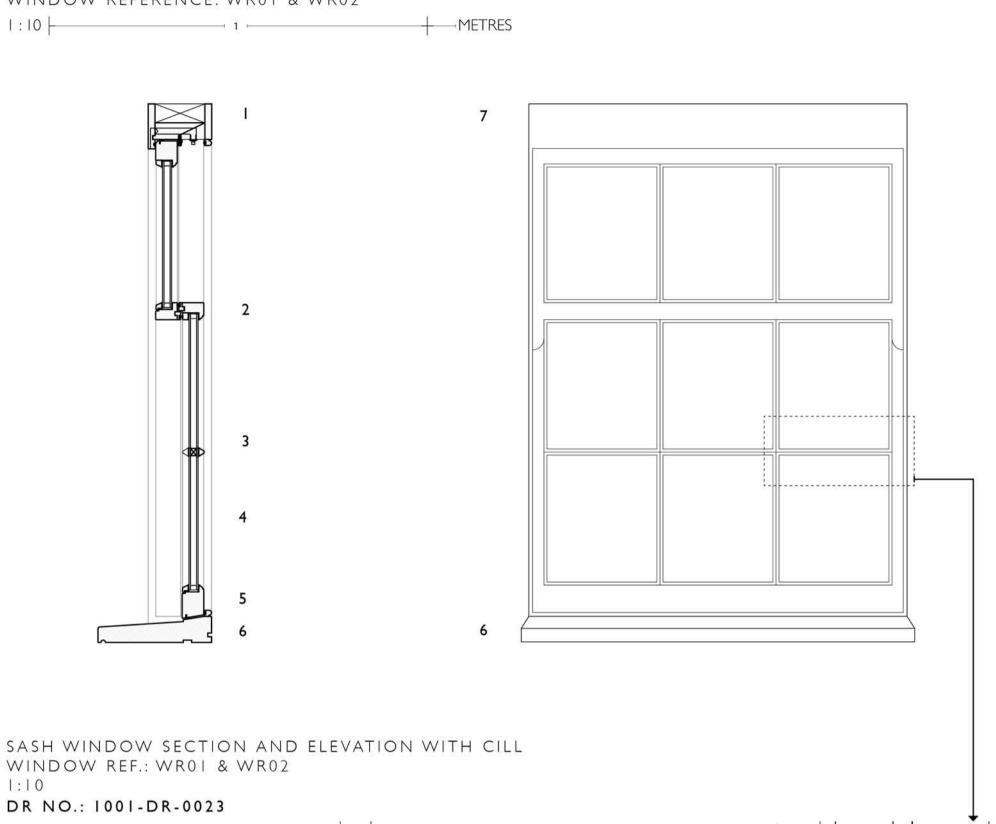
DETAILS I. HEAD OUTSIDE LINING 2. PULLEY HANGING 3. PARTING BEAD 4. TOP SASH FRAMING 5. DOUBLE GLAZING 6. SPLAYED AND REBATED MEETING RAILS WITH DECORATIVE HORN TO BOTTOM RAIL OF TOP FRAME
